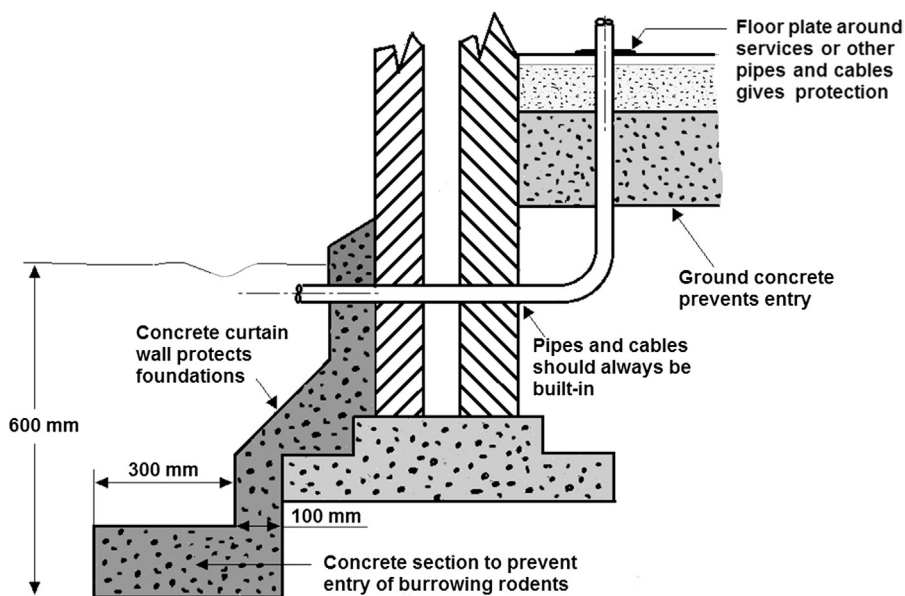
Pest-proofing measures to prevent entry through foundations. A curtain wall of at least 600 mm below ground level with a bottom member turned outwards for a distance of 300 mm prevents or reduces the ingress of burrowing rodents (CCFRA, 2003b; Holah et al., 2014).
